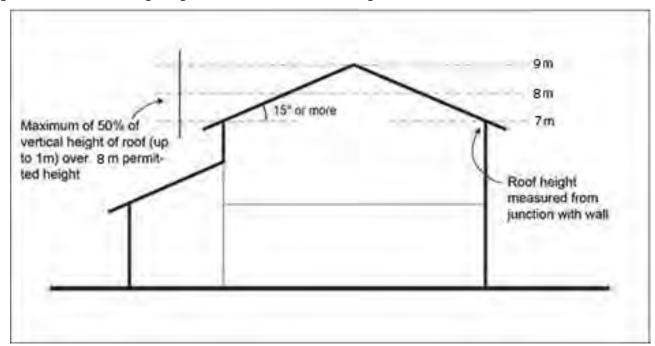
Building height in the Residential – Single House Zone
